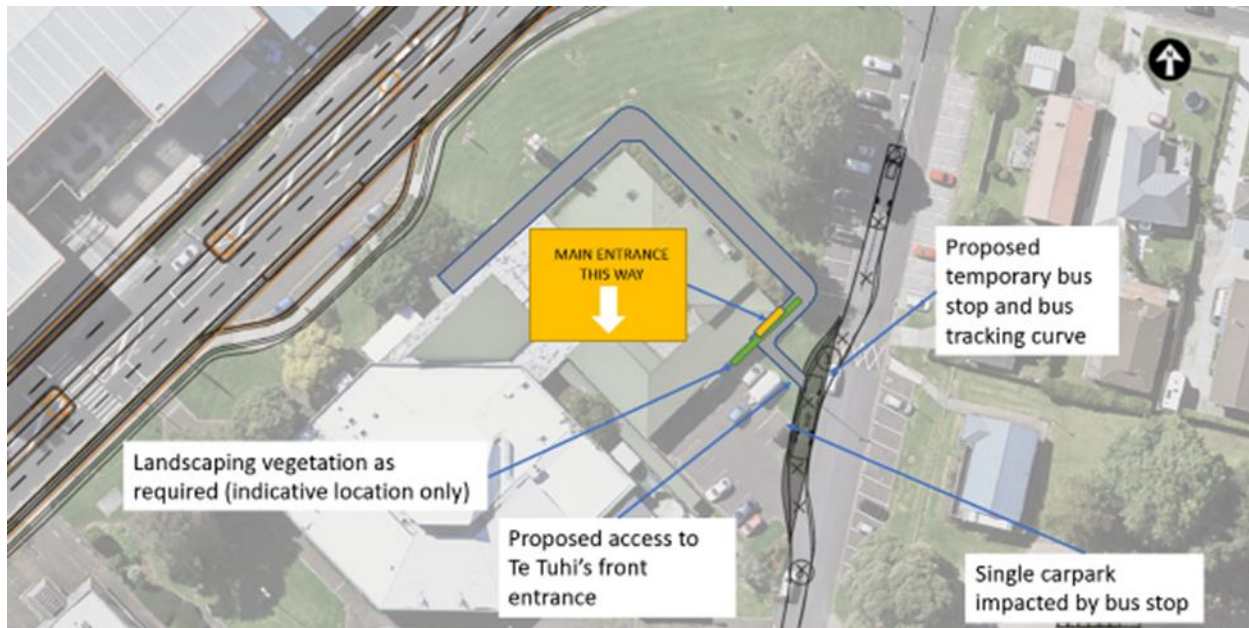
Construction Access Arrangements for 13 Reeves Road
